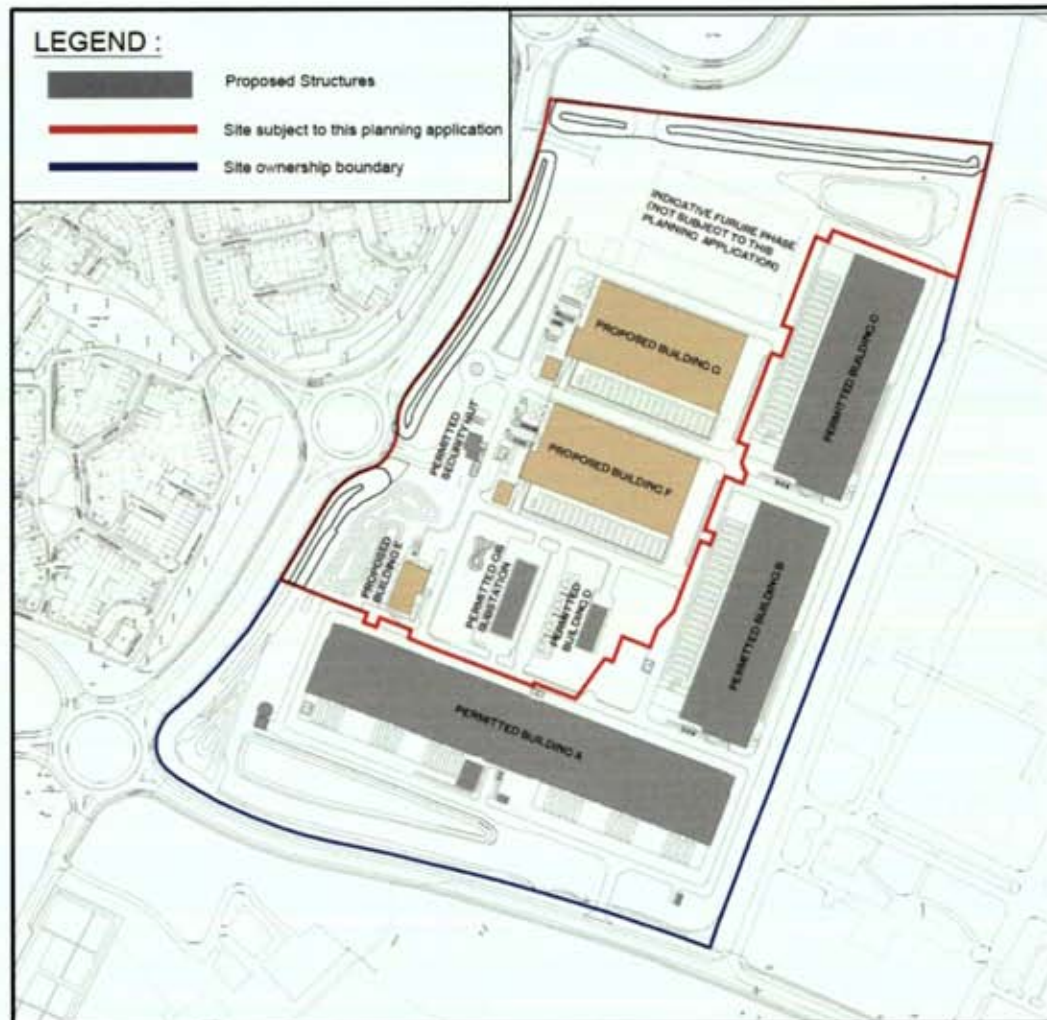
Site layout plan of the proposed and permitted developments (Source: Henry J. Lyons Architects November 2022)
